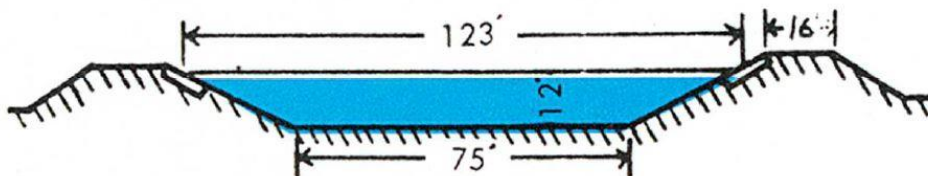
Earthen Embankment Canal Section: Erie Canal: Three Rivers to Tonawanda and Champlain Canal
